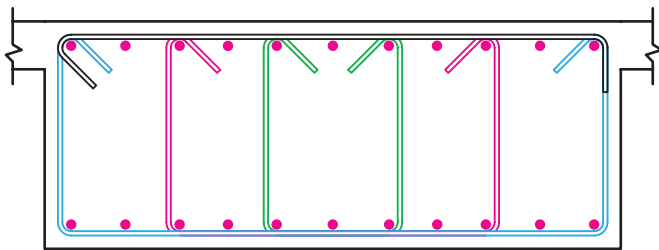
A second alternate configuration consisting of a single U-stirrup across the net width of the beam, two smaller-width U-stirrups nested in the beam interior, and a stirrup cap
